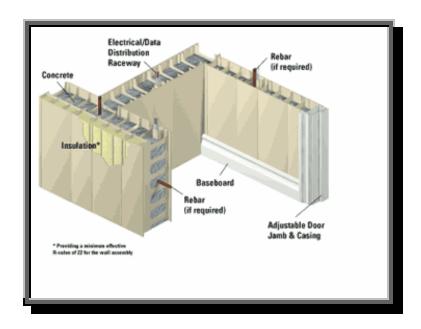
Typical Royal Building System Wall Sections (Royal Building Systems)
